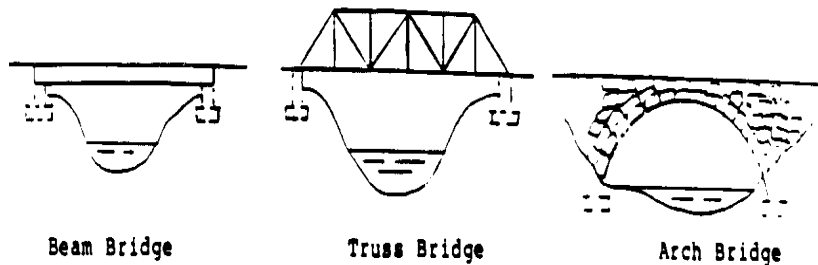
Three Types of Bridges: Beam, Truss, and Arch
